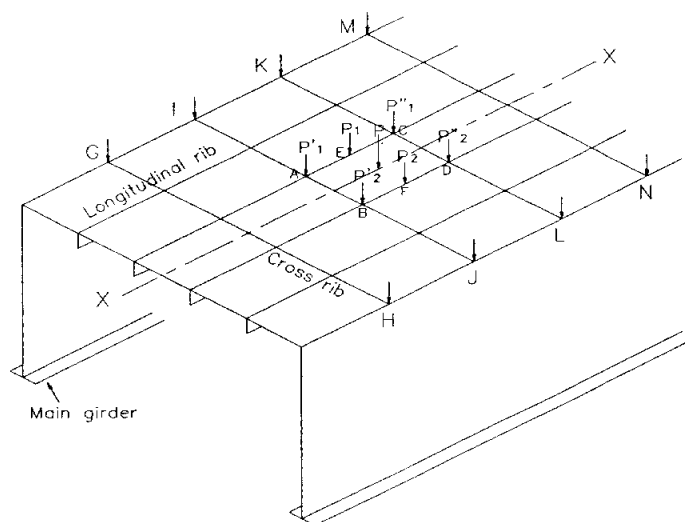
The Transmission of Loads on Steel Deck Bridge
